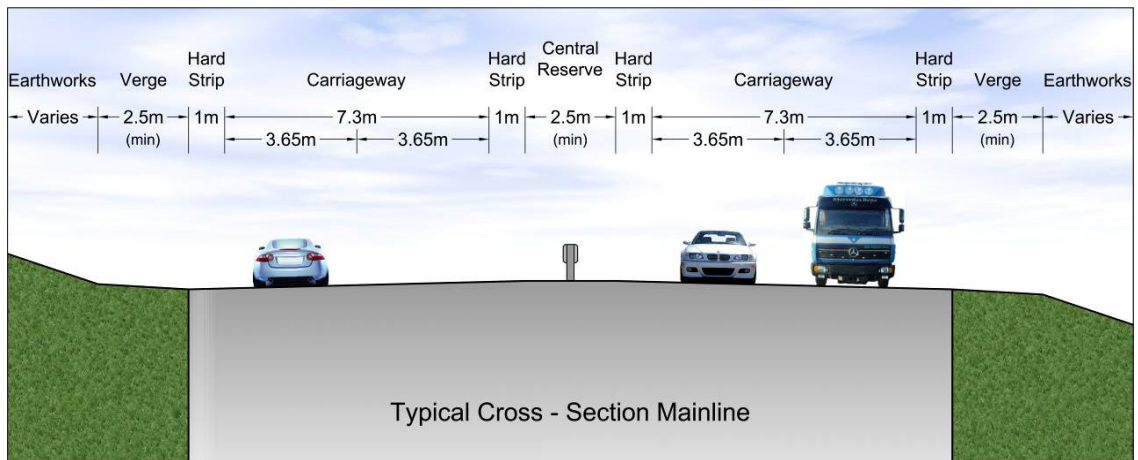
Indicative Mainline Cross Section for the Dual Carriageway Section of the A5WTC
